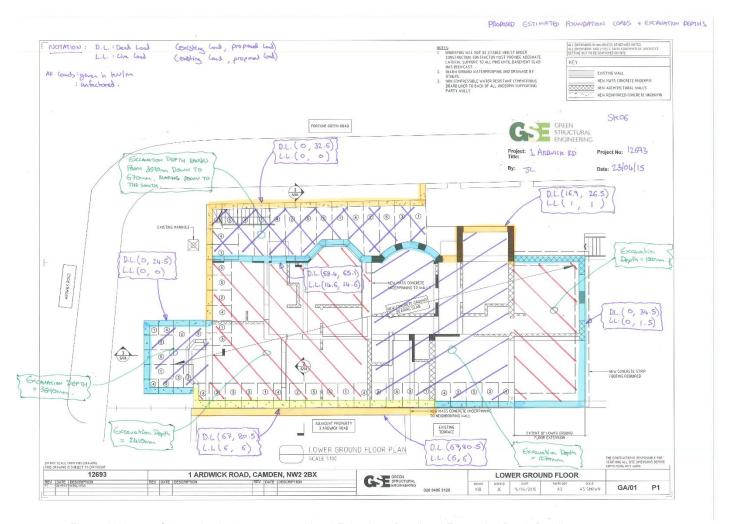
Layout of the underpinning system and Load Take down Detail and Excavation Depth Detail
